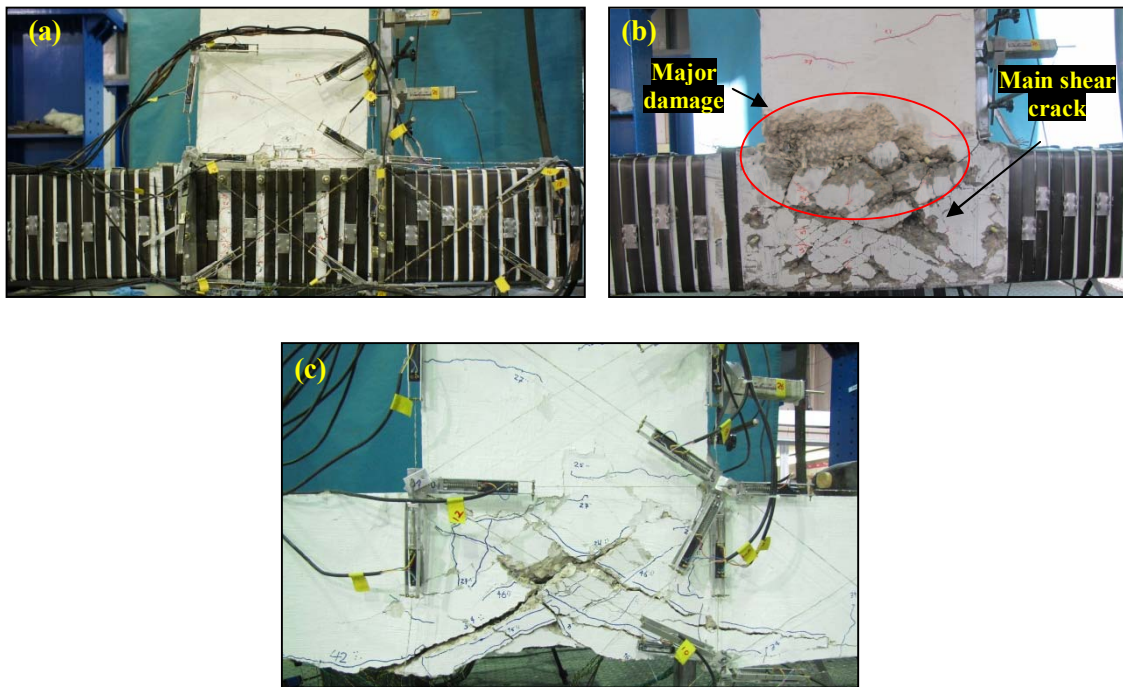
Final cracking Pattern a) with strips installed, b) after removing the strips and c) unit JC-1
